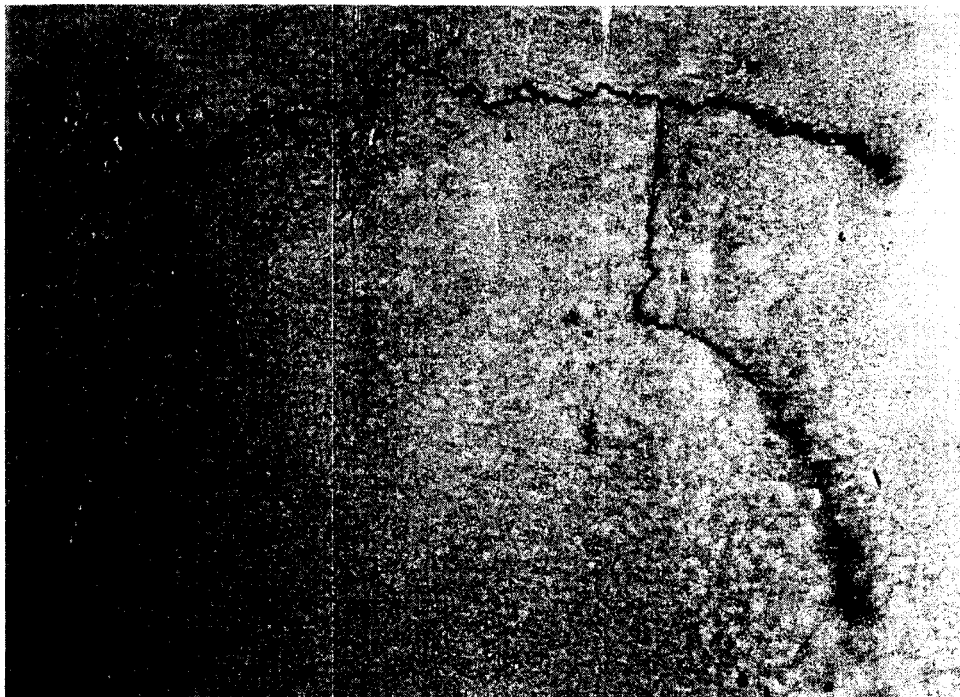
Fatigue Crack in Wall of Transformer Base of Specimen S-6
